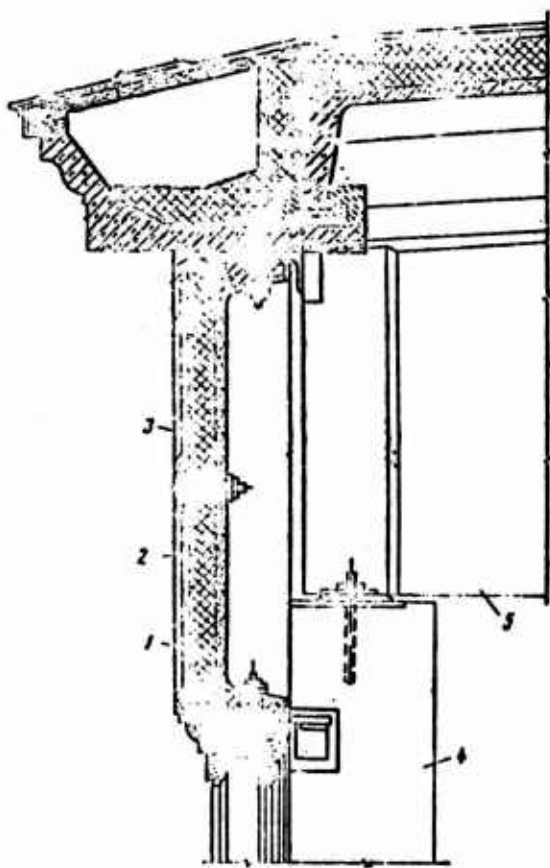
The part of the wall filling of a mine structure with large wall panels along with support ferroconcrete and light facing slabs: 1 - support ribbed ferroconcrete slab with standard sizes, 6×1.2 m; 2 - light facing slabs; 3 - effective heat insulation; 4 - ferroconcrete column; 5 - structural flooring beam.
